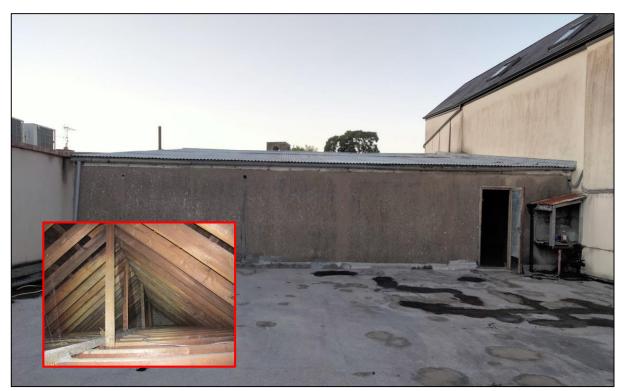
South facing corrrigared roof of Donohoe's Foodfare. Inset photo of attic. Photo facing north
